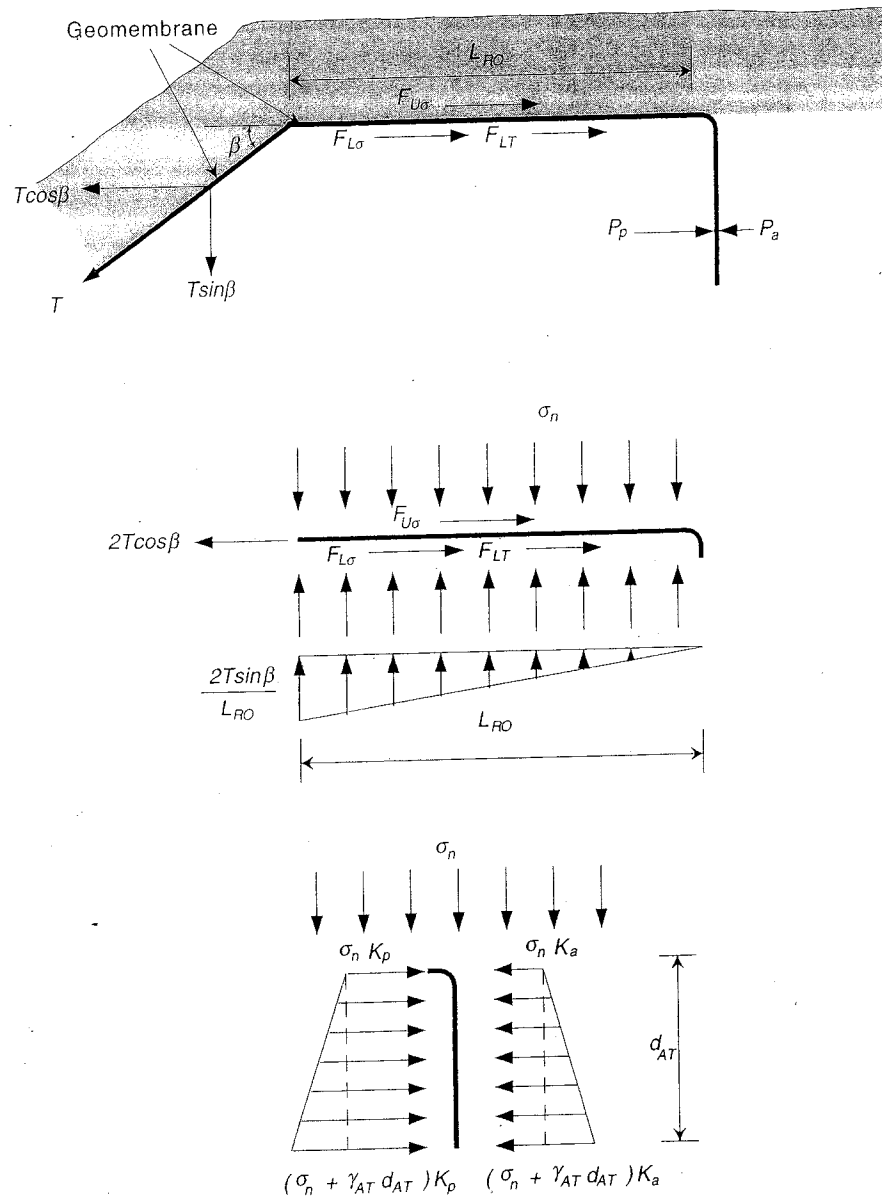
Cross section of geomembrane runout section with anchor trench and related stresses and forces involved.
